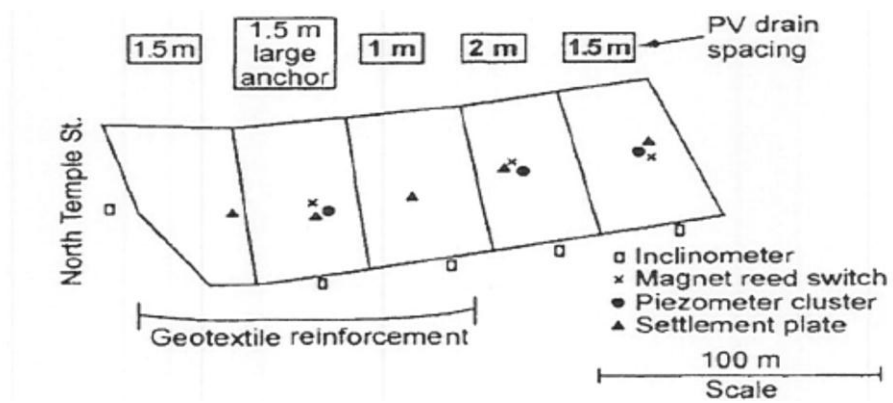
North Temple Street Layout (Saye and Ladd 2004)
